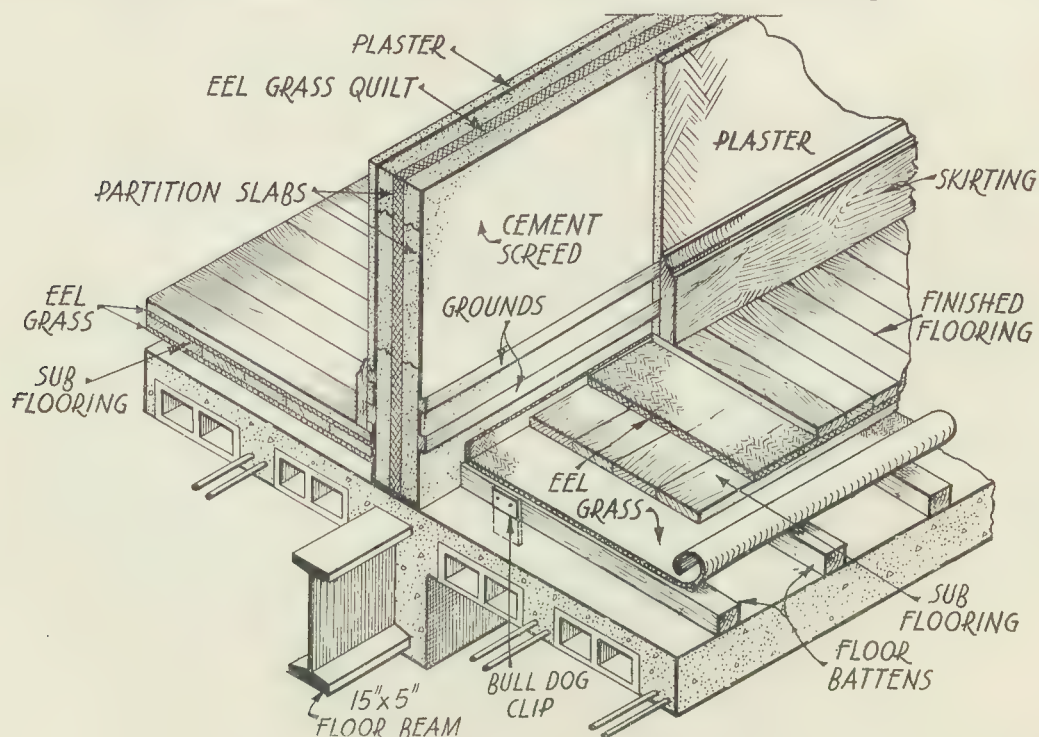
SOUND-PROOFING PLASTER SLAB PARTITION WALL AND HOLLOW BLOCK UPPER FLOOR
